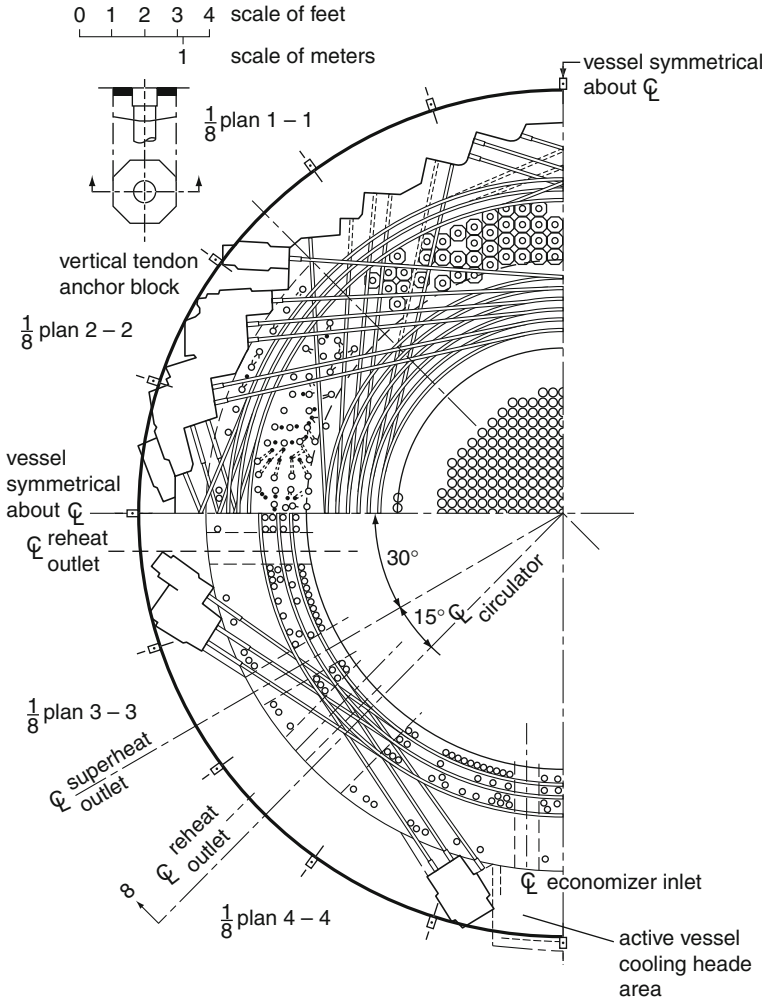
Dungeness B vessel prestressing layout (plan)
